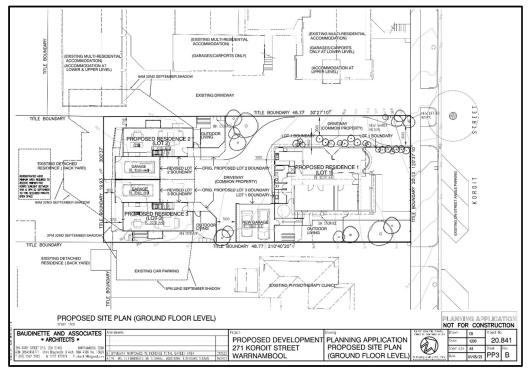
Proposed Site Plan (Ground Floor). Source: Application Documents.
